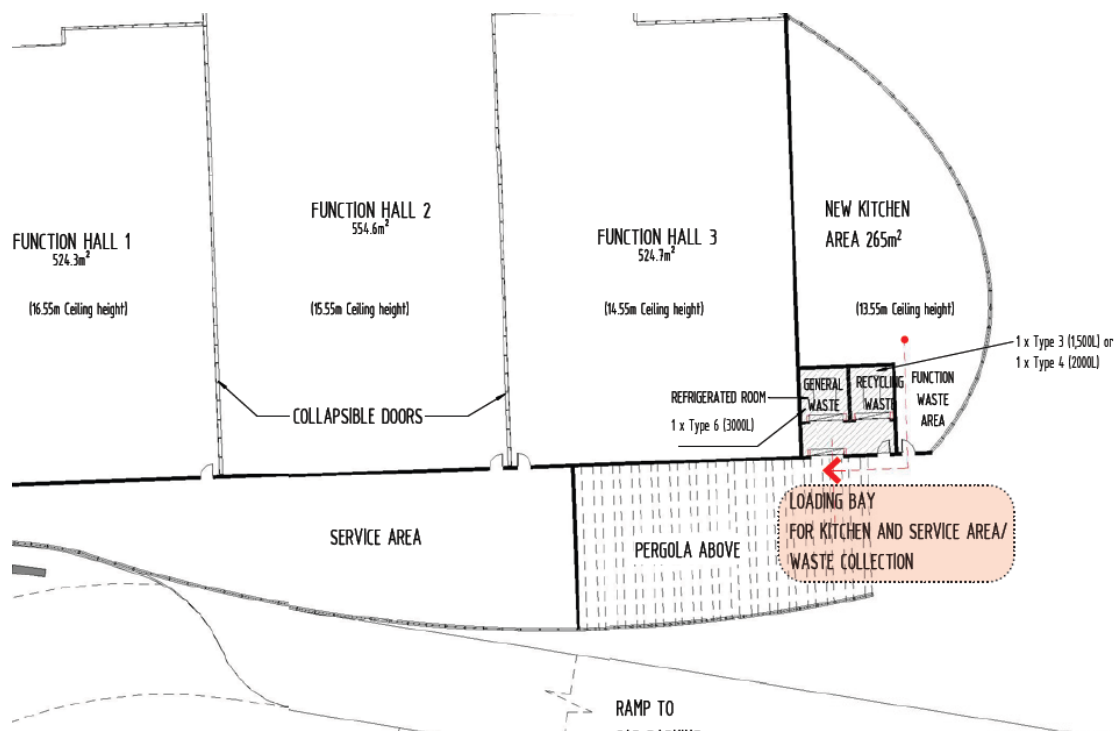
Waste Storage and Servicing Locations on Ground Level (Function Facility zoomed in)
